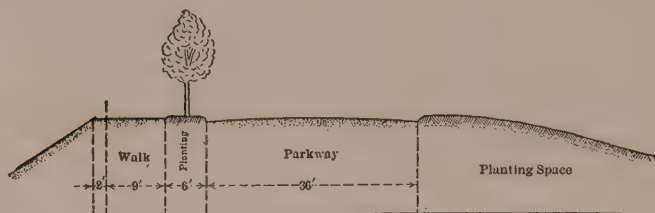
Typical Section of Park Highway. Massachusetts Metropolitan Park Commission.
